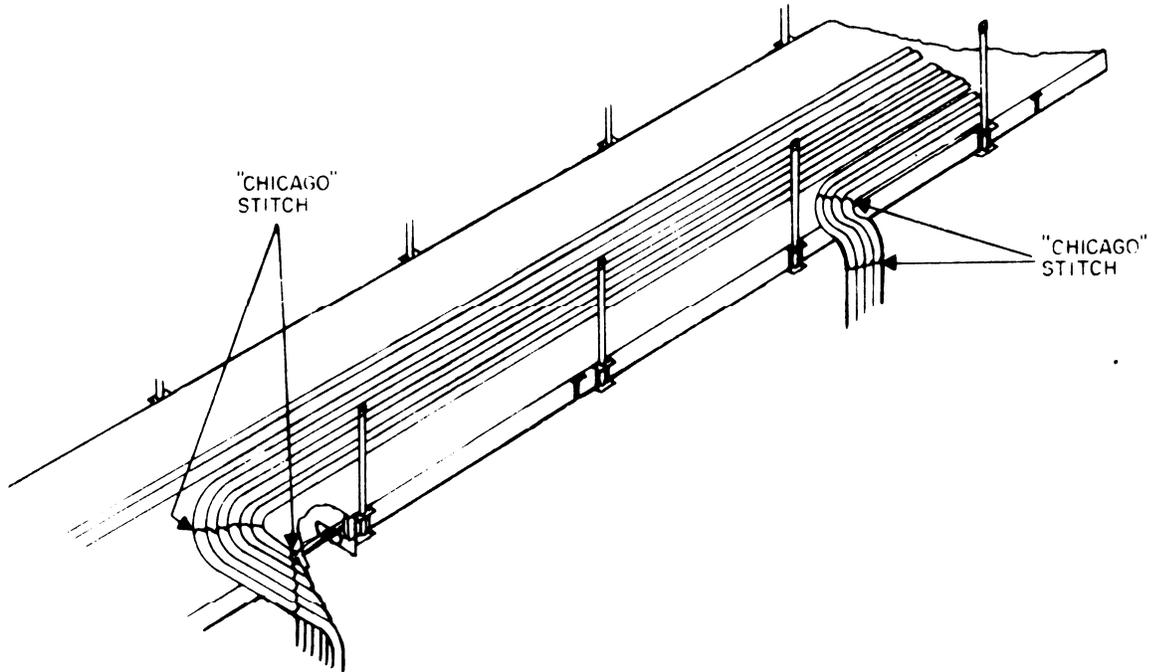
Typical Cable Run on Trough Showing Break-Offs and Stitching at Break-Offs.
